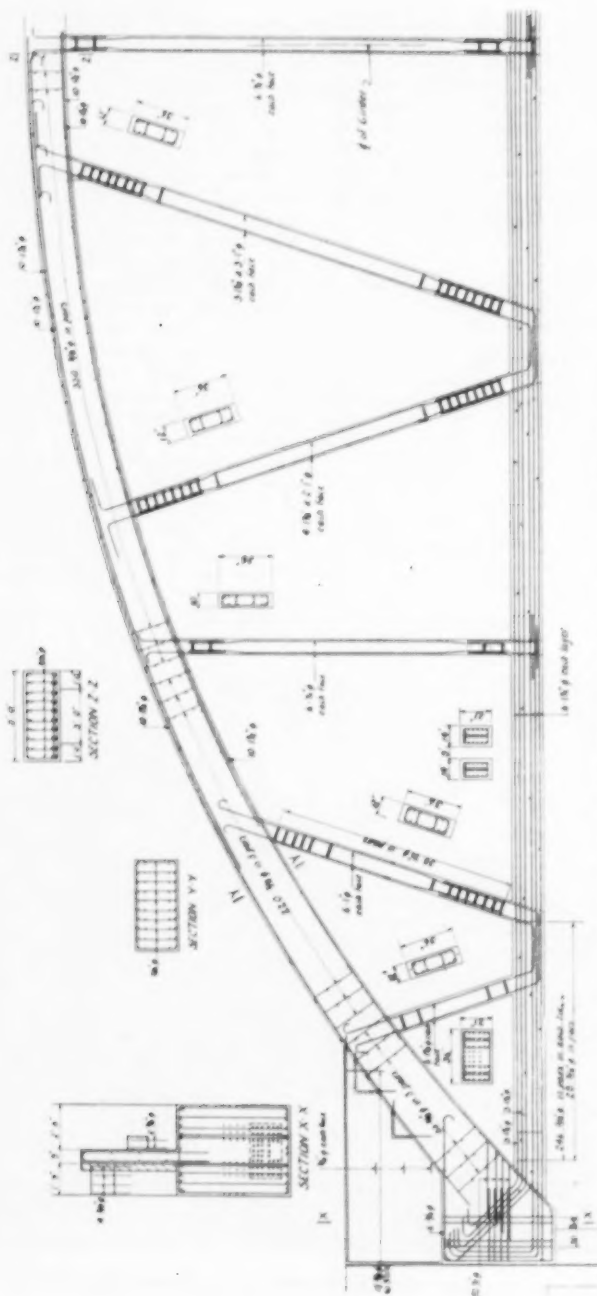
Detail of Bowstring Girder of 132-ft. Span.
